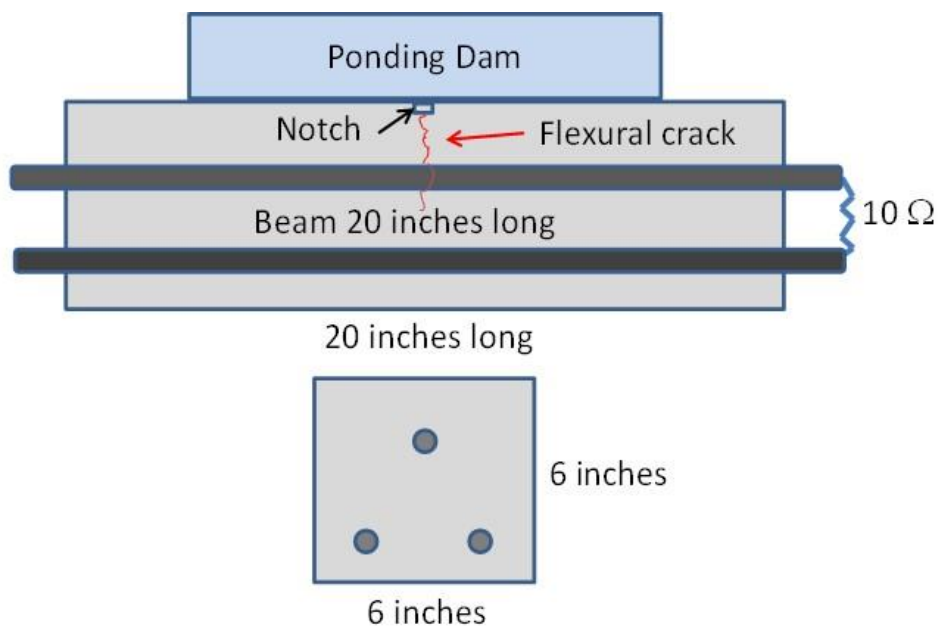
Side view schematic of crack specimens with a dam on top and crack.
